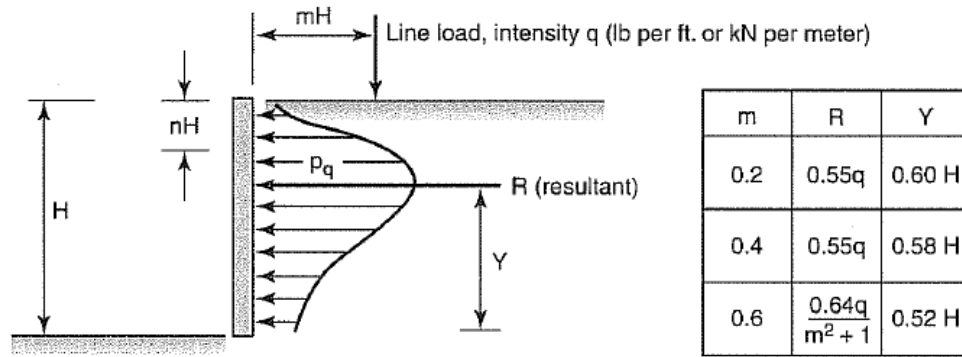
Pressure distribution against vertical wall resulting from line load of intensity  $q$ .
